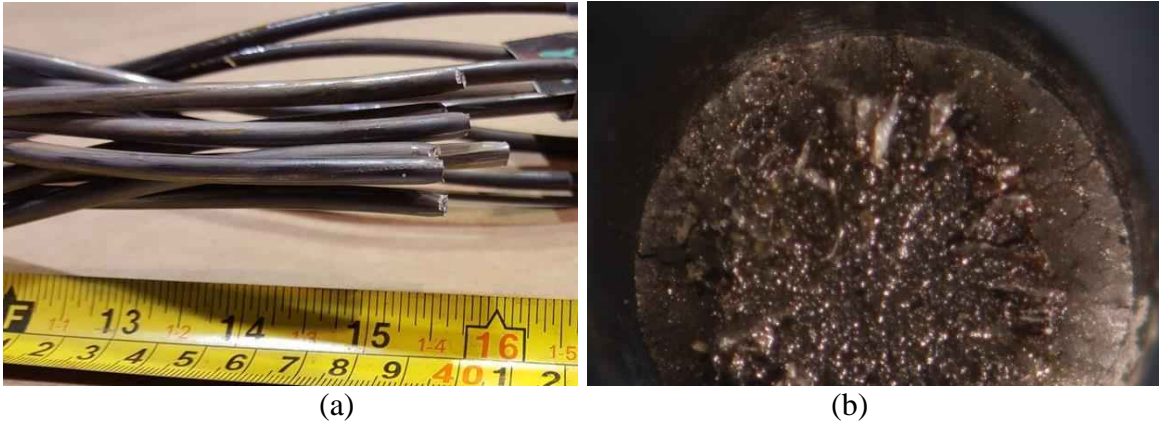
Fracture surfaces of control specimens (a) c-2 (b) magnified fracture surface
